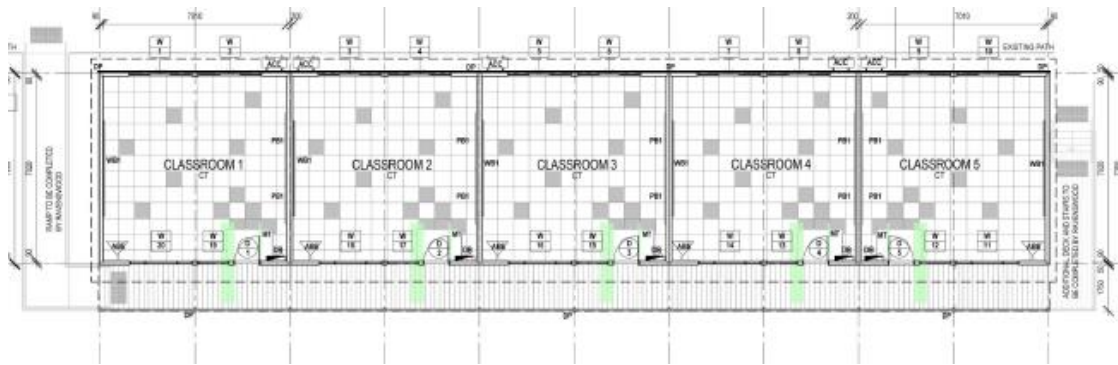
Proposed use of the existing demountable building (Source: Fleetwood)
